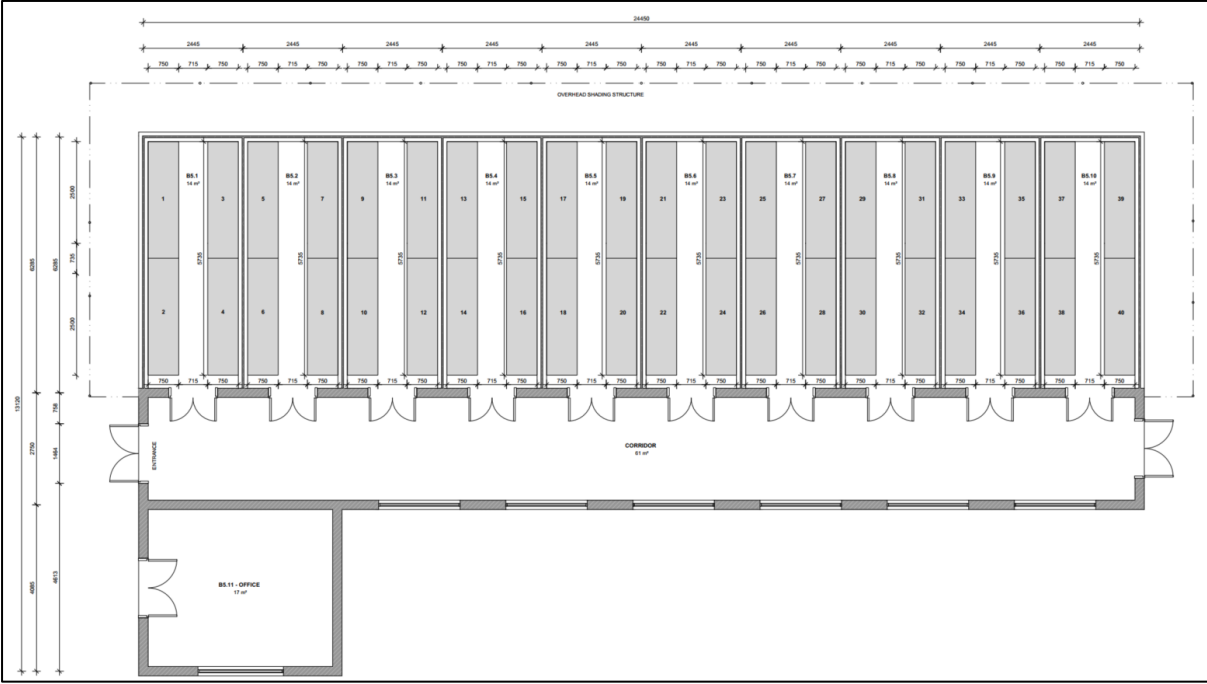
BASIC LAYOUT FOR B5 GREENHOUSE (SEE ADDENDUM A DRAWINGS)
